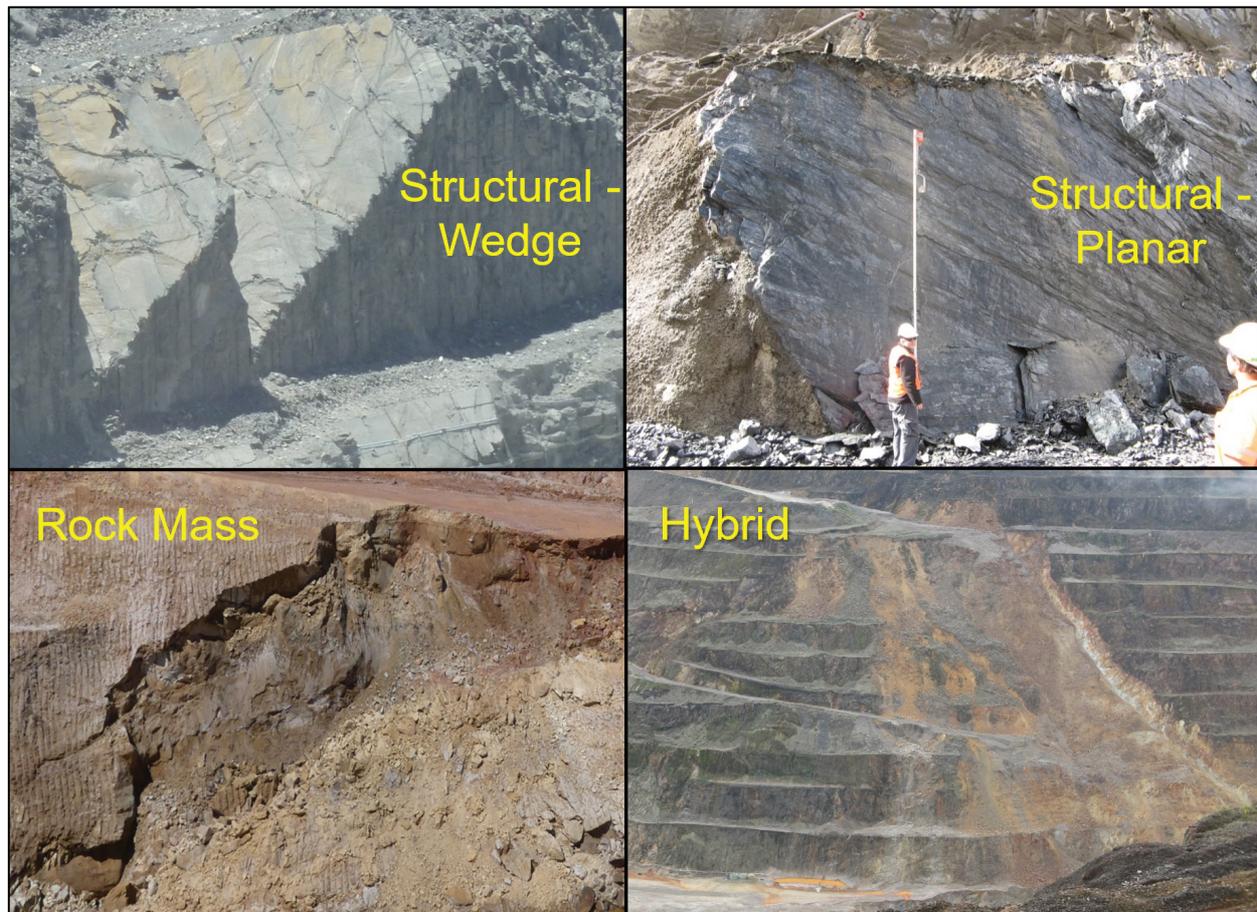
Examples of some of the common slope failure modes (toppling failure not shown)
